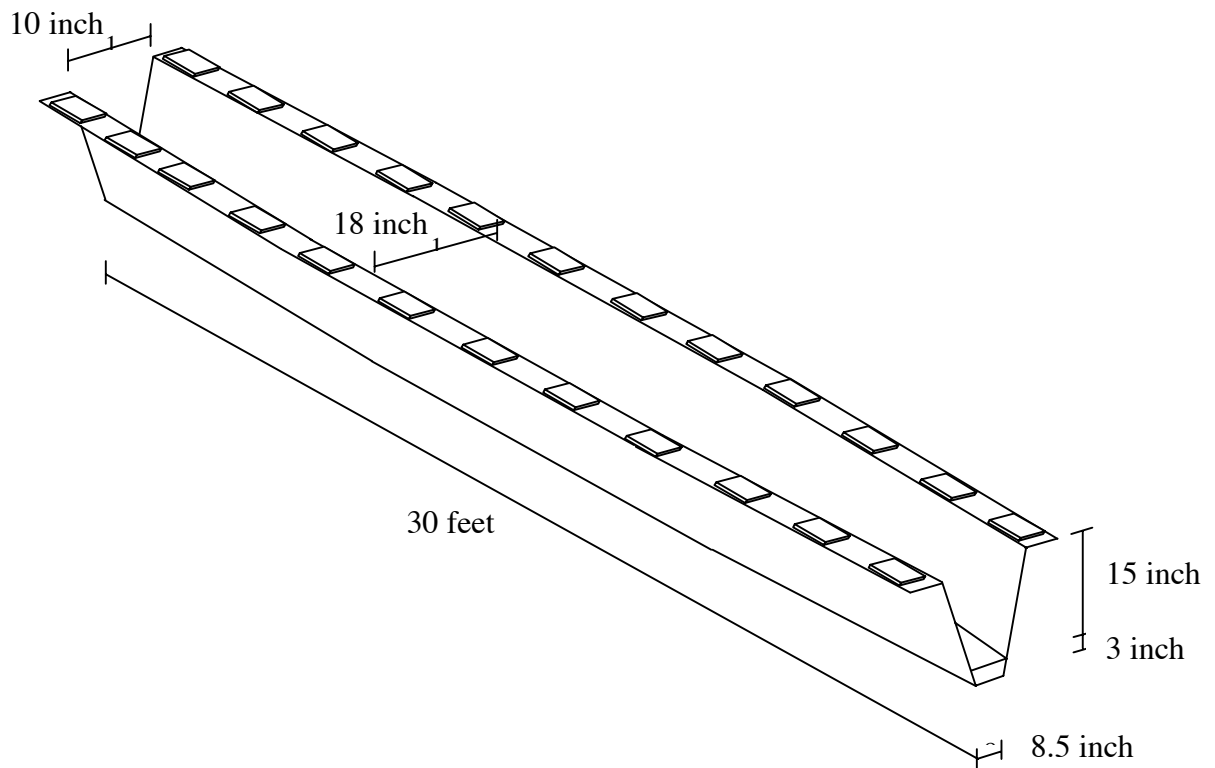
Dimensions of Trapezoidal Hand-lay Up Beam
